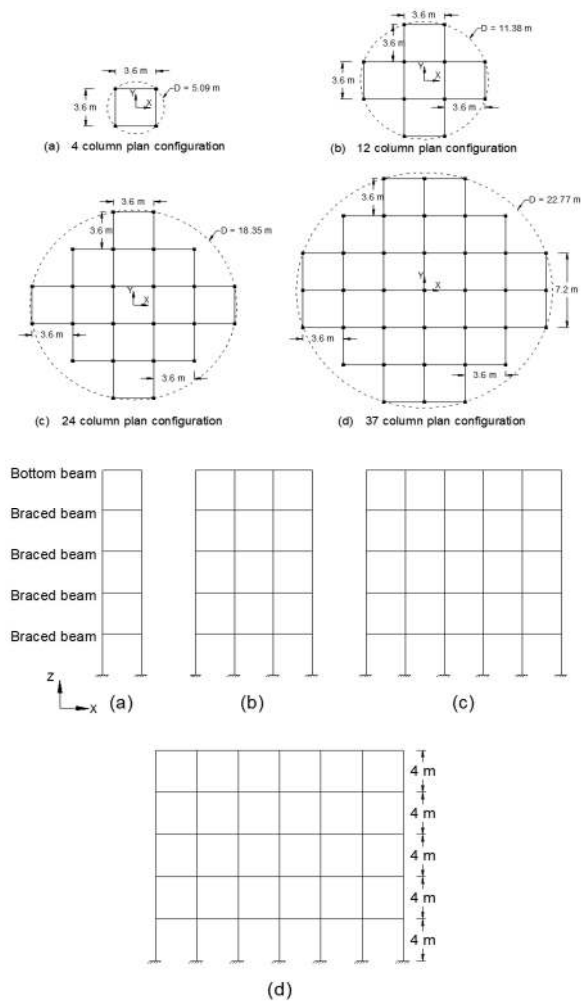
Staging plan configuration and elevation details of (a) small, (b) medium, (c) large and (d) very large tanks
